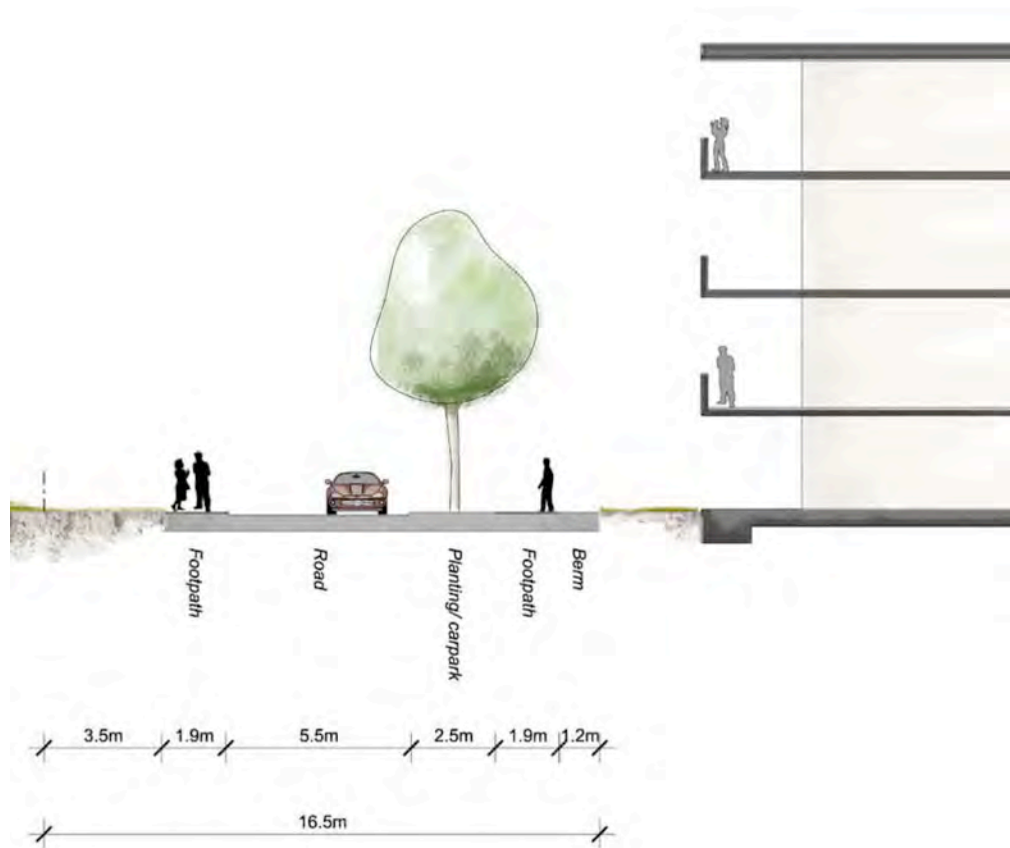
Indicative Section – Streets adjacent to Racetrack (16.5m minimum width where it is closest to the racetrack)
